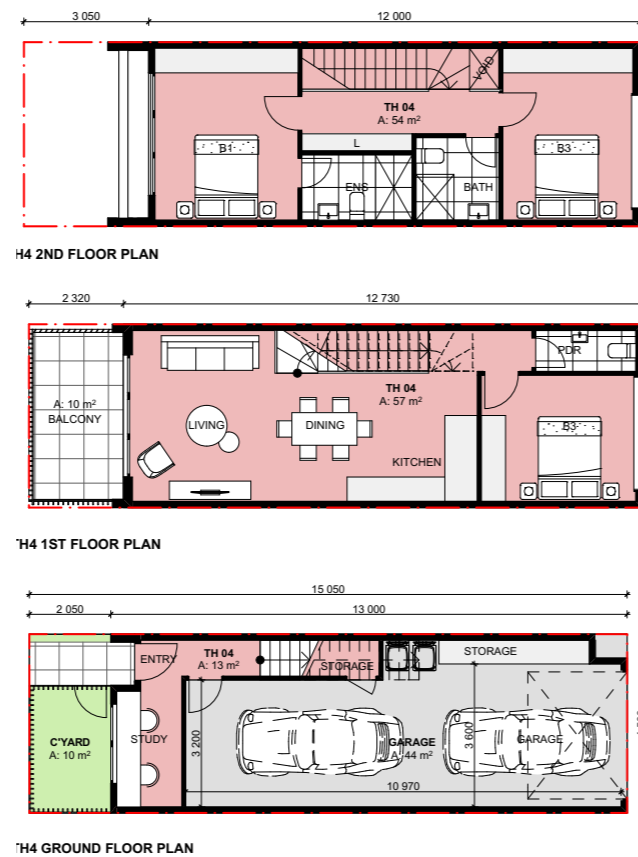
Townhouse Type 4 (Source: Plus Architecture)
